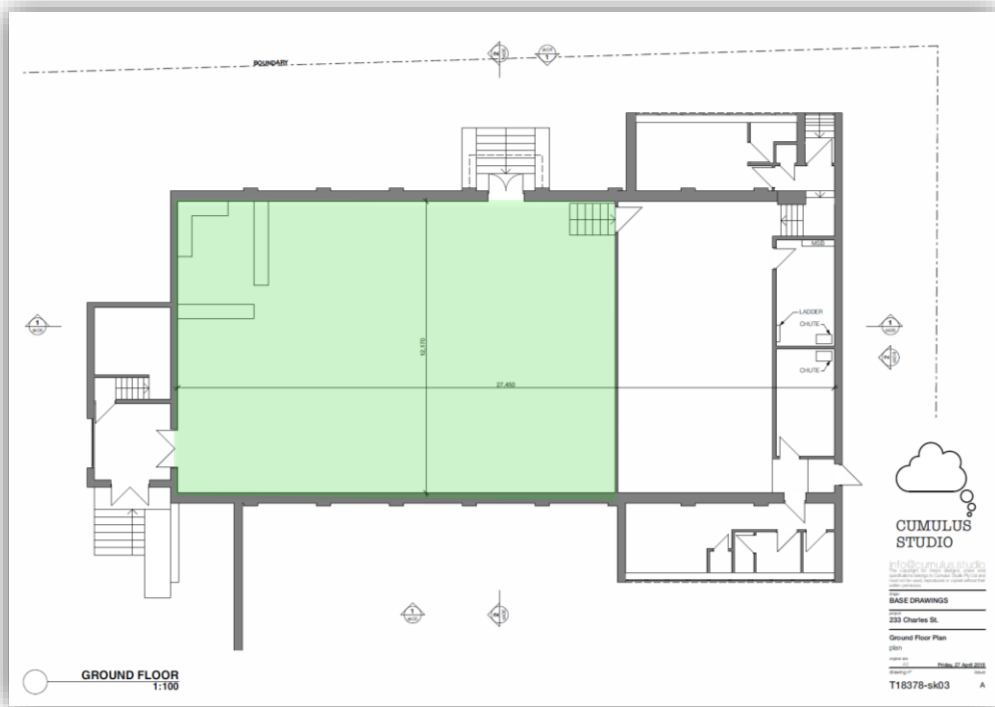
Potters House floor plan (F45 Training area shaded in green).
